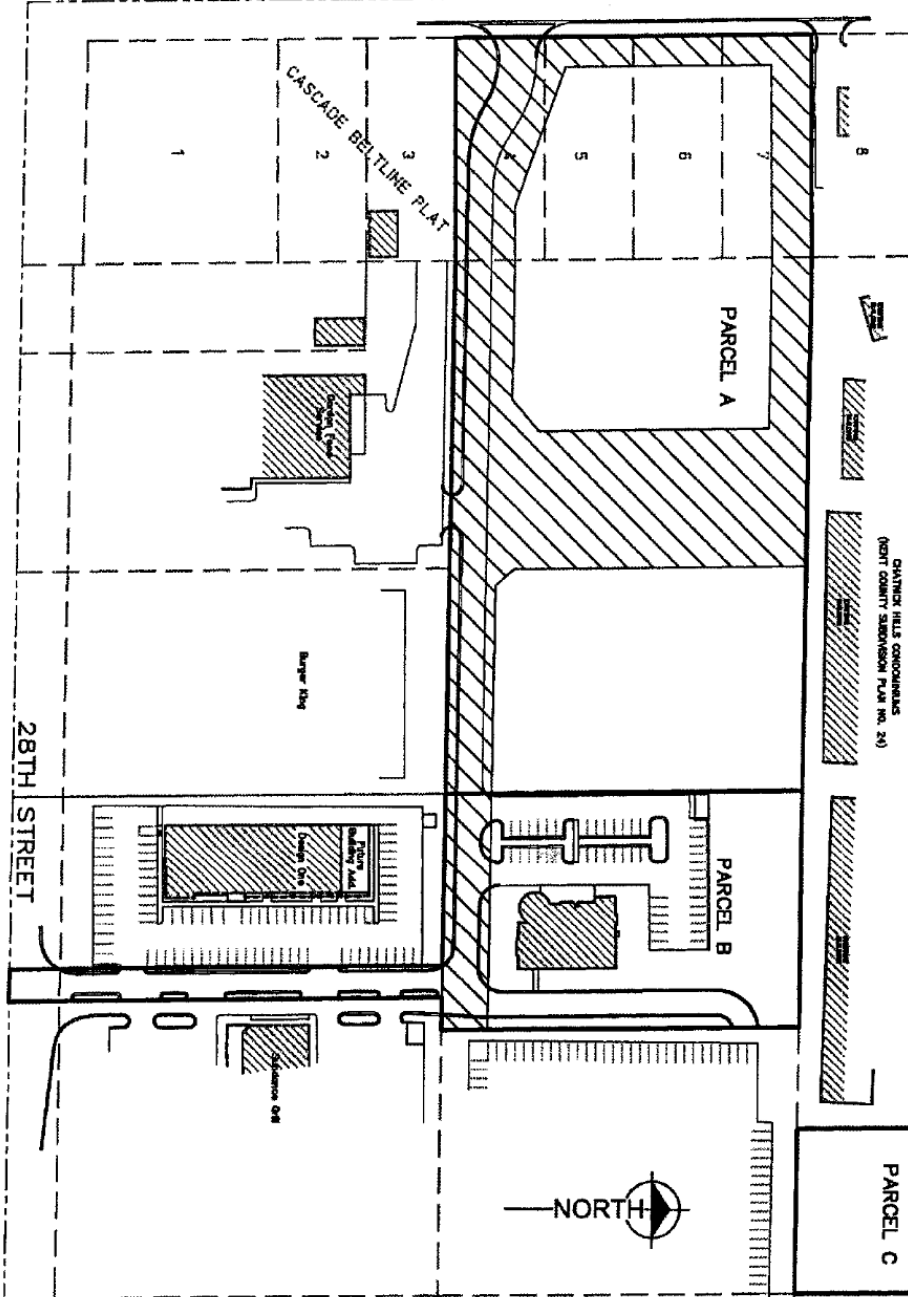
EXHIBIT G STORMWATER FACILITIES EASEMENT AREA
